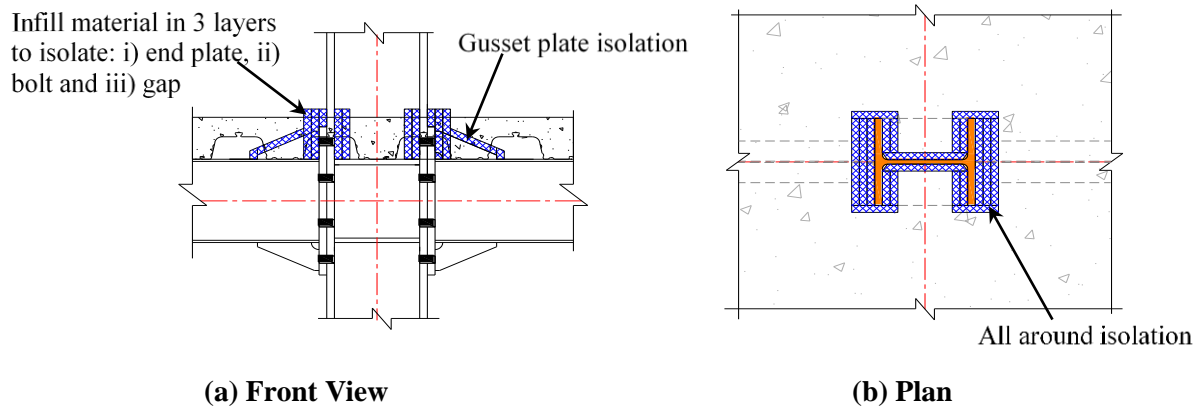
Bolted End Plate Connection – Slab Isolation Details
